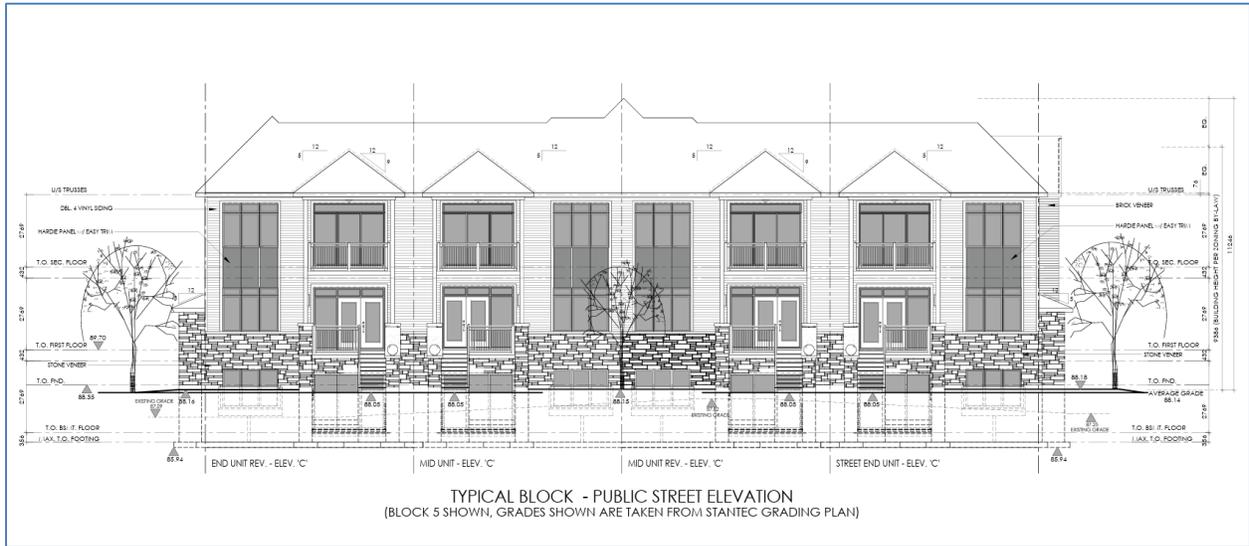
The typical public street elevation that will front onto Brian Coburn Boulevard and Compass Street.
